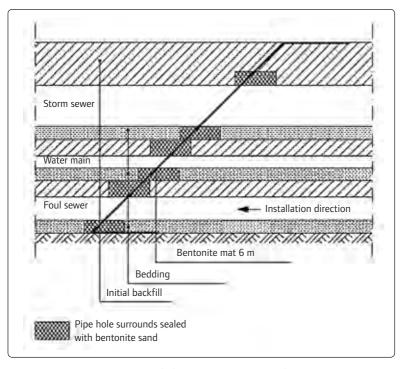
Water-retentive trench dam construction using a bentonite mat.
